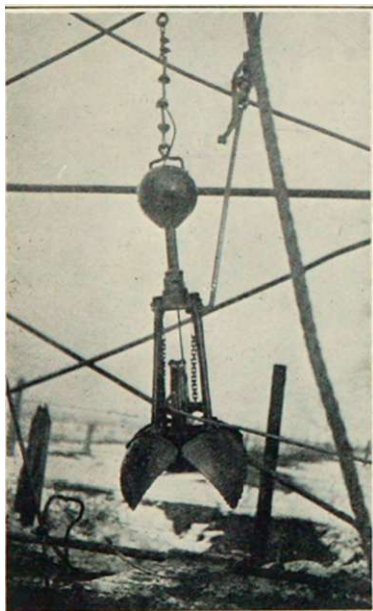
Hammer type of orange-peel bucket rigged with one line.
